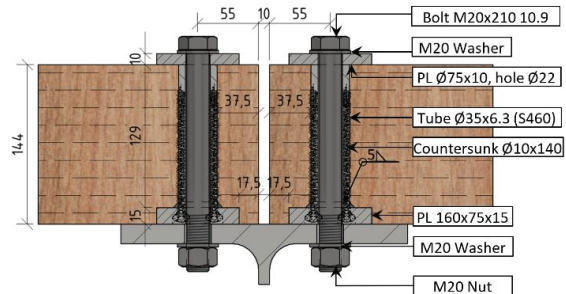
Details of shear connection type 3 (SCT-3), transversal cut.
